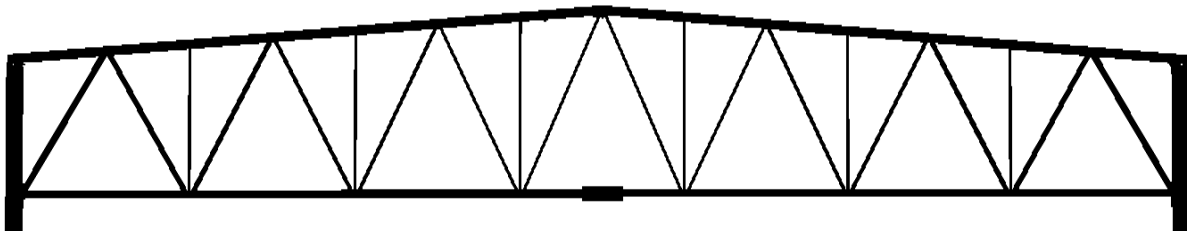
Typical truss configuration with roof slope of 1:20 ($\sim 3^\circ$) [138]
